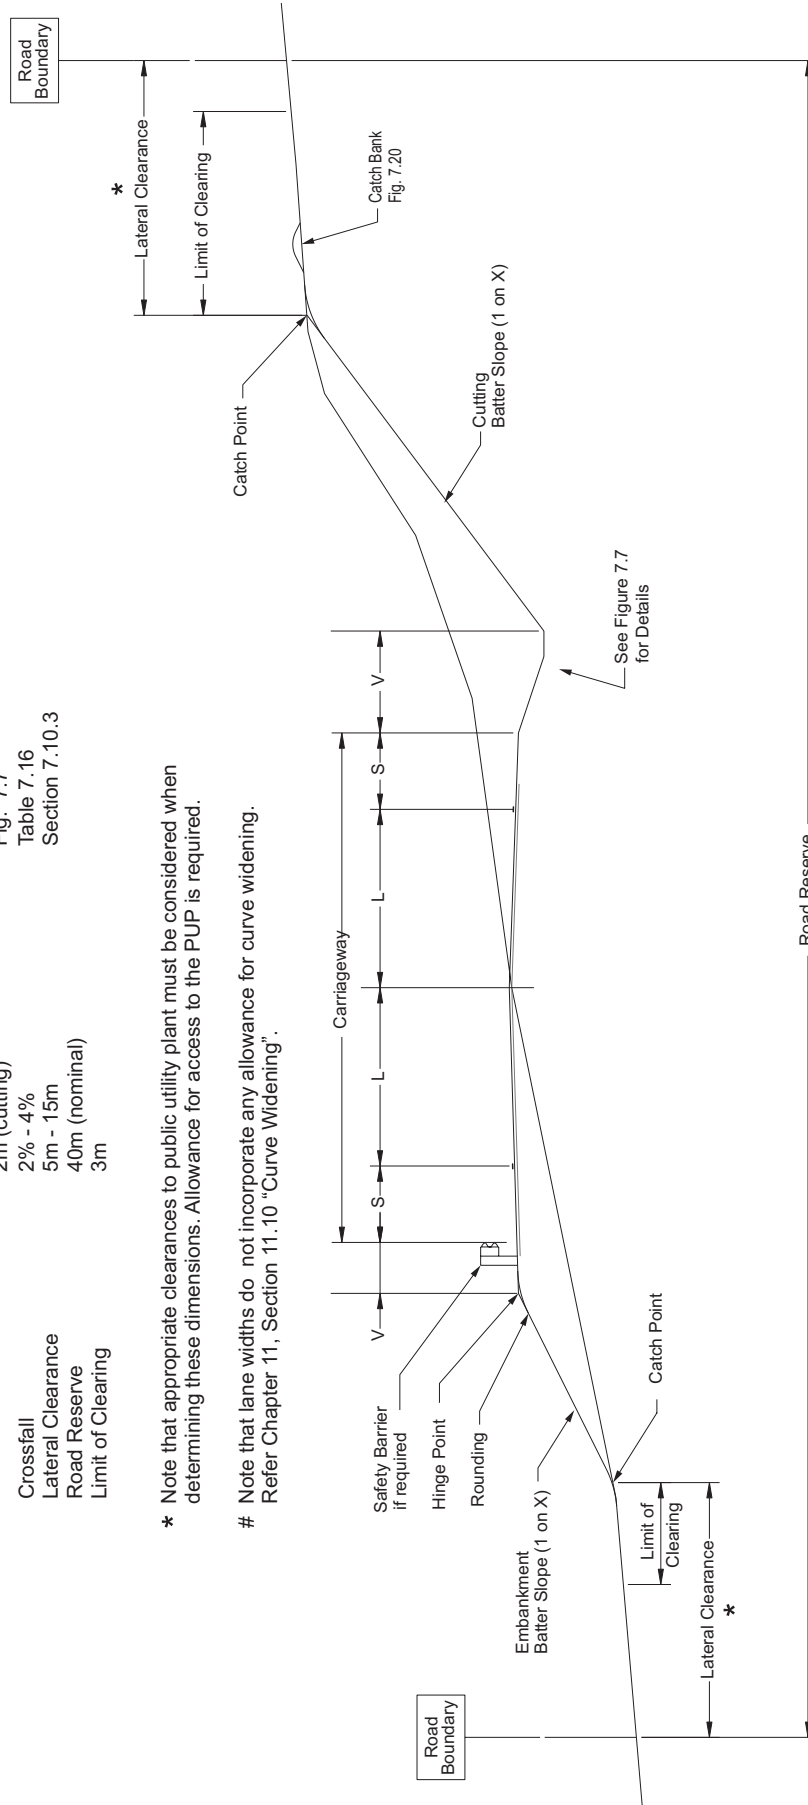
Typical Cross Section of Two Lane Two Way Rural Road
